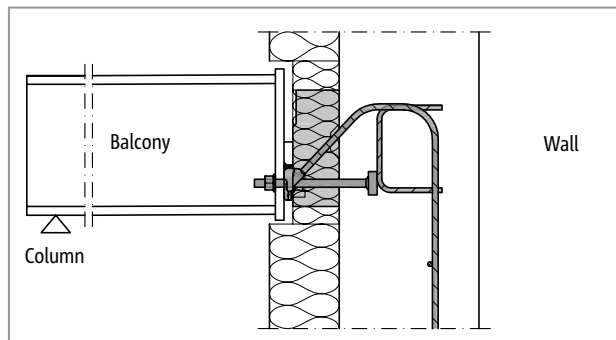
Schöck Isokorb® T type SQ-WU: Special construction; required with connection to a reinforced concrete wall with a wall thickness from 200 mm
